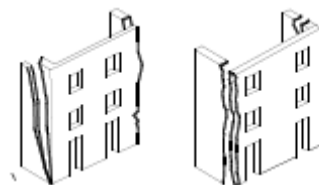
Failure mechanisms associated with the façade. a) Out-of-plane of the façade; b) Detachment of the façade.
